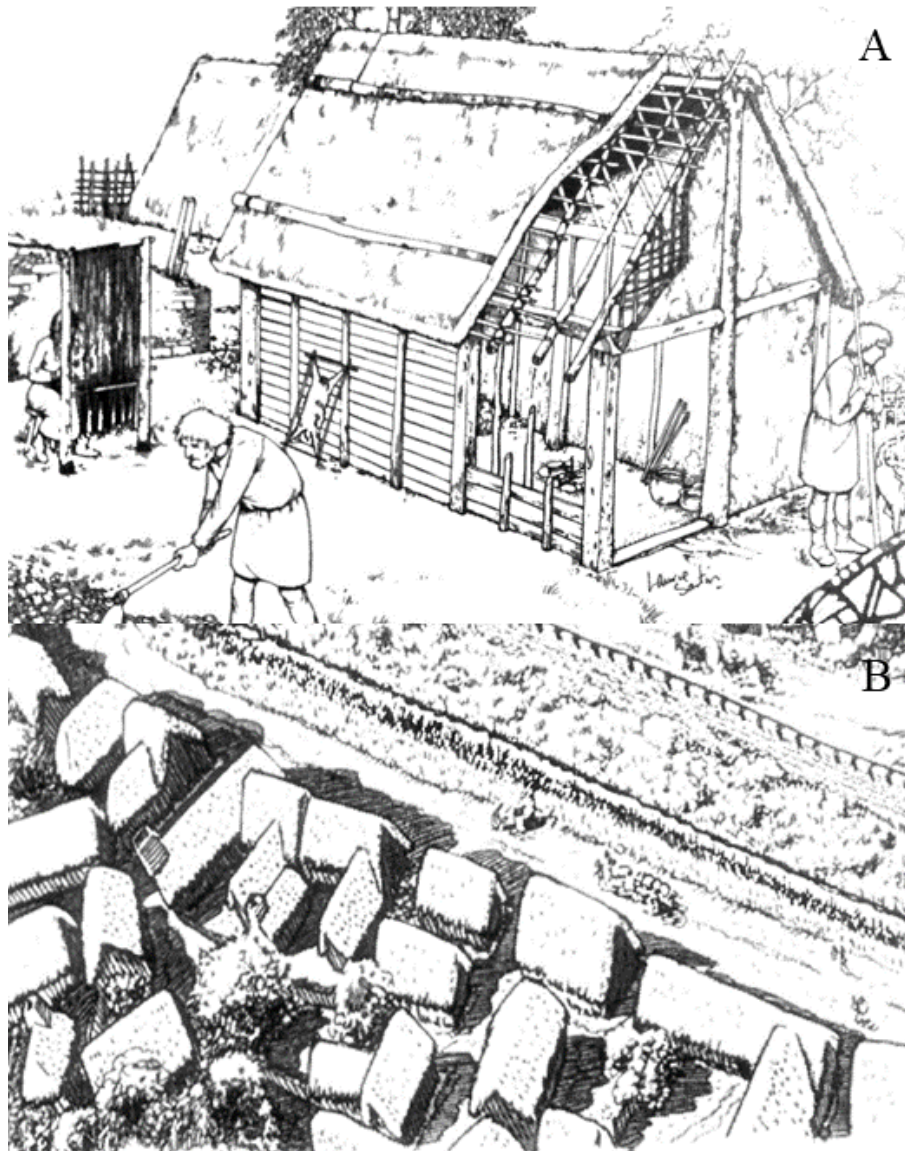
Reconstruction of One Storey Style Wealden Houses. A. Example of a One Storey Wealden House (Sartin 2001). B. Example of a Community Outside of the City's Wall (Bowen 2001).
